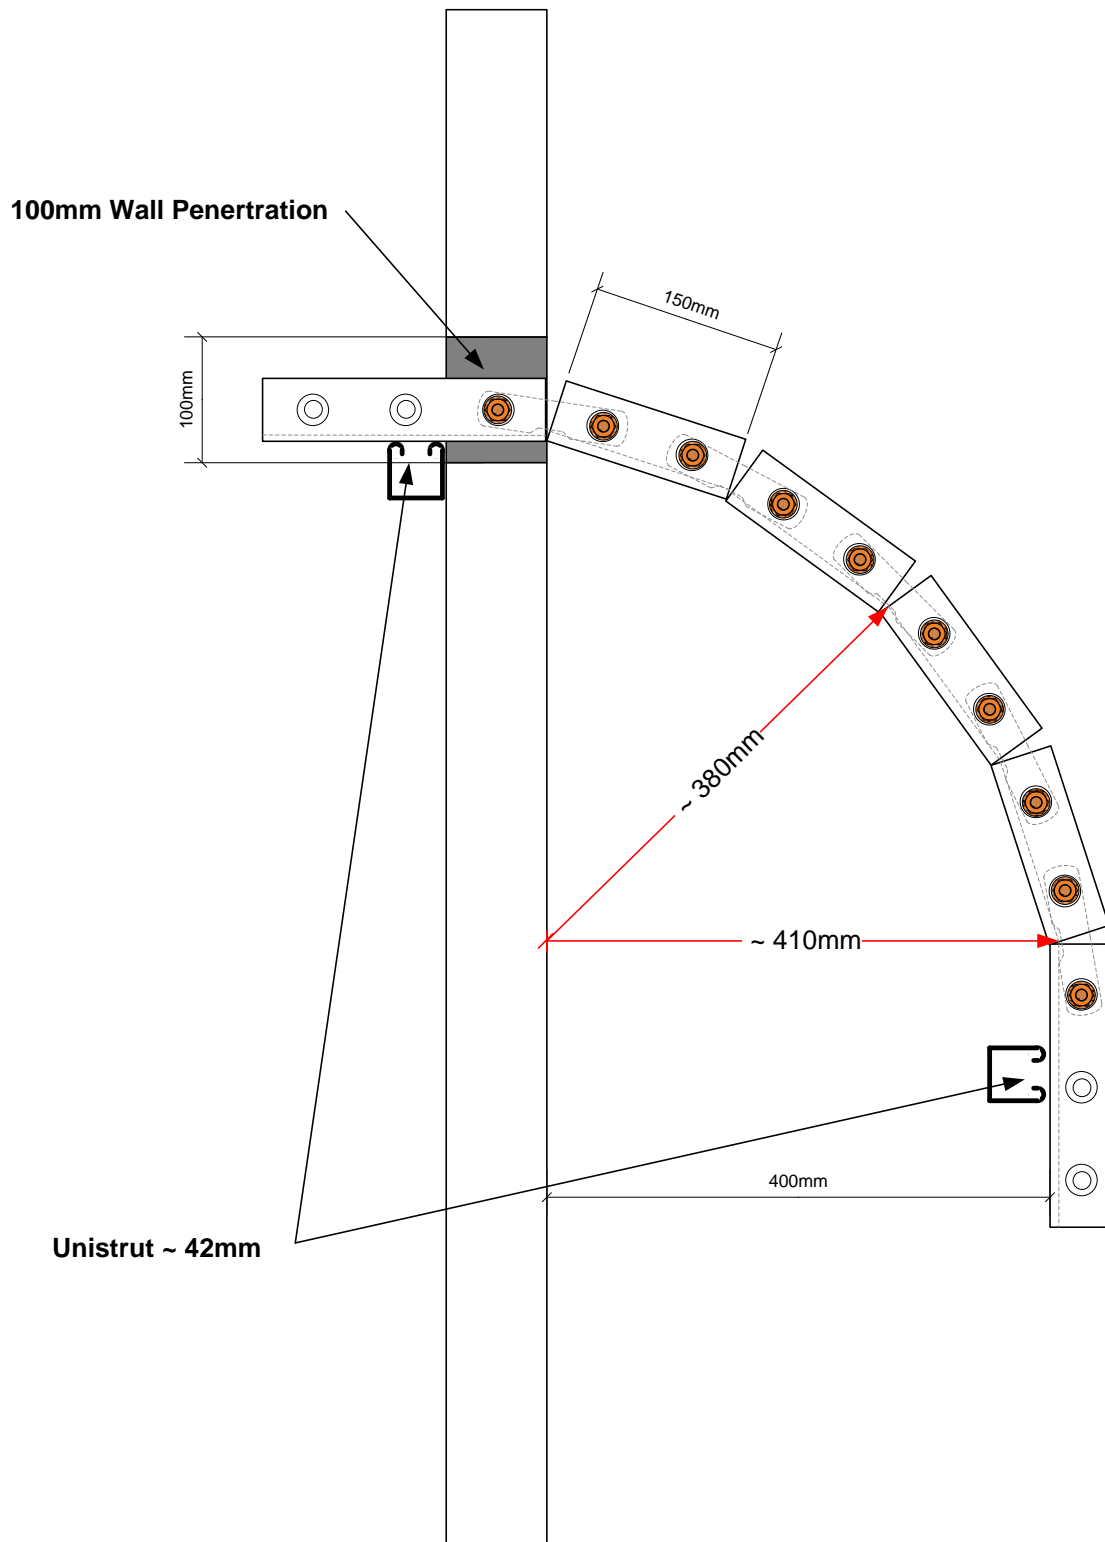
Convex Vertical Bend – wall penetration, max distance from wall
